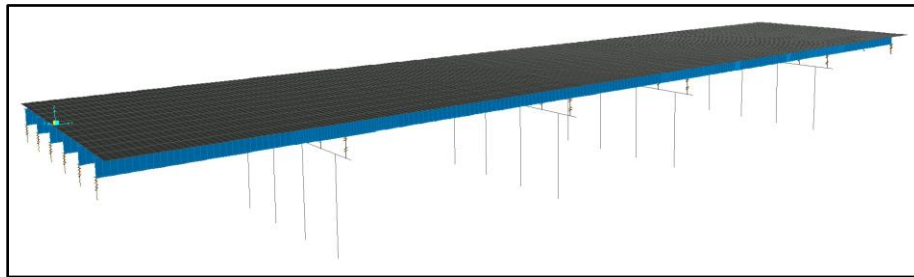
A detailed three-dimensional finite element model of a bridge
